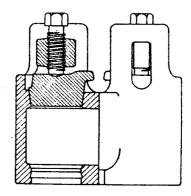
The "mule ear" type return tube header is the most commonly used in the process industry.
